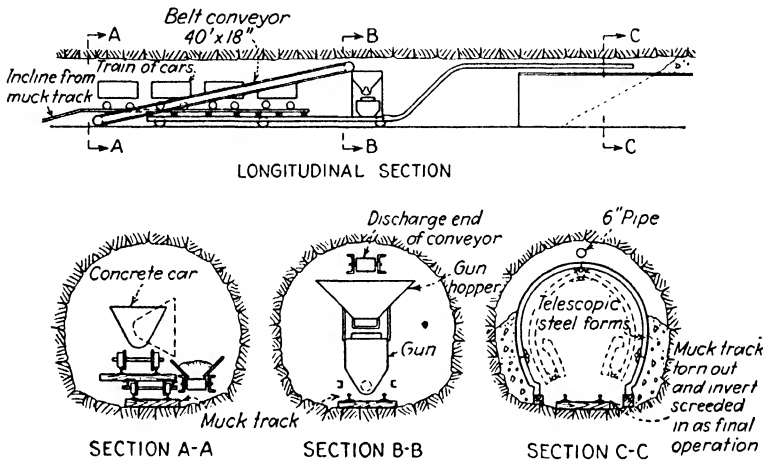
Concrete-placing layout for a small tunnel. The belt conveyor, dump track and pneumatic placer are all mounted on one carriage which runs on the muck track.
